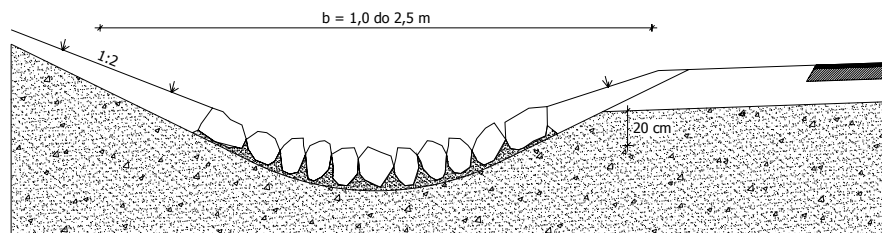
Curved (trough-shaped) road ditch with a rough lining for a longitudinal fall of  $J > 10 \%$
